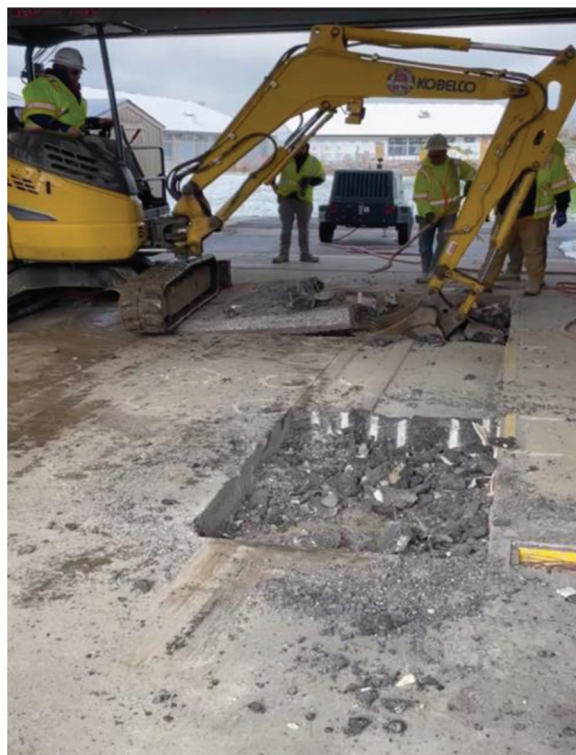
Crawler excavator used to excavate the DWPT unit cross section.
